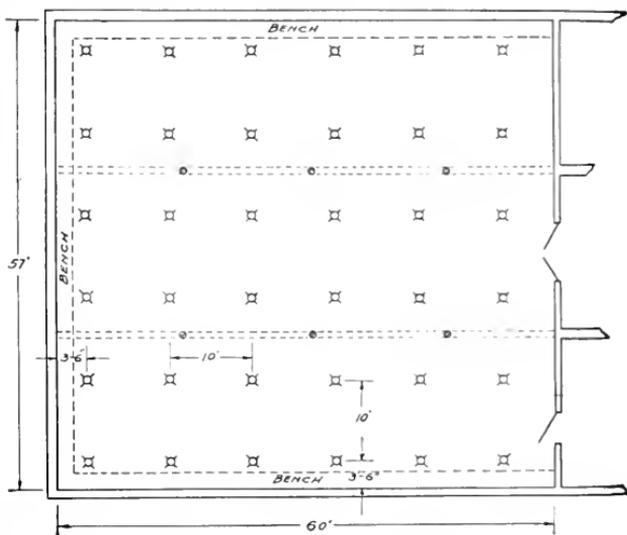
Floor Plan of a Furniture Factory Problem 3.
